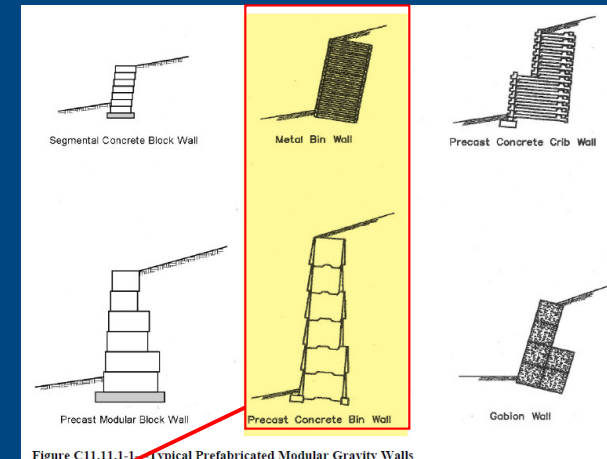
Typical Prefabricated Modular Gravity Walls
